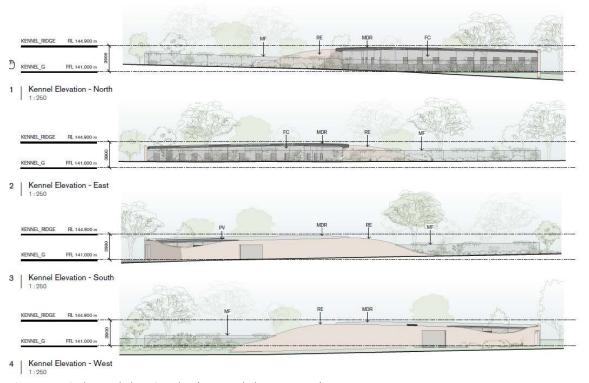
Typical Kennel Elevation Plan (Proposed Plans, Tzannes)
